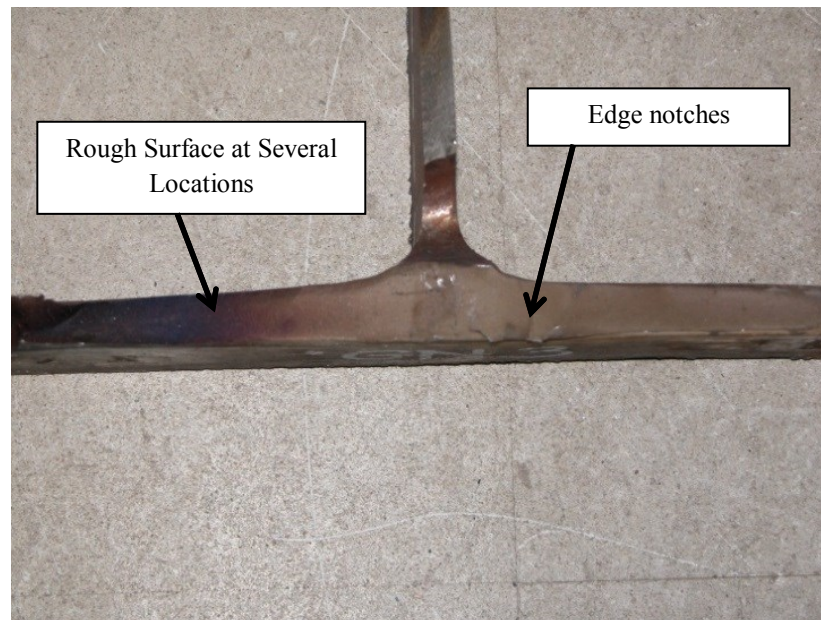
Fractured surface of side 2 of specimen G-N-3.
